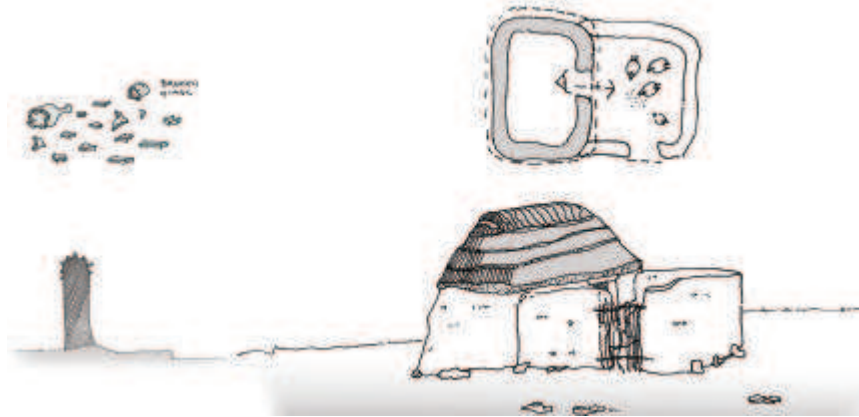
This is a sketch of two simple walls using the same technology – hand moulded walling with mud. The wall as enclosure of property has shards of glass to prevent people climbing over (drawing by author).
